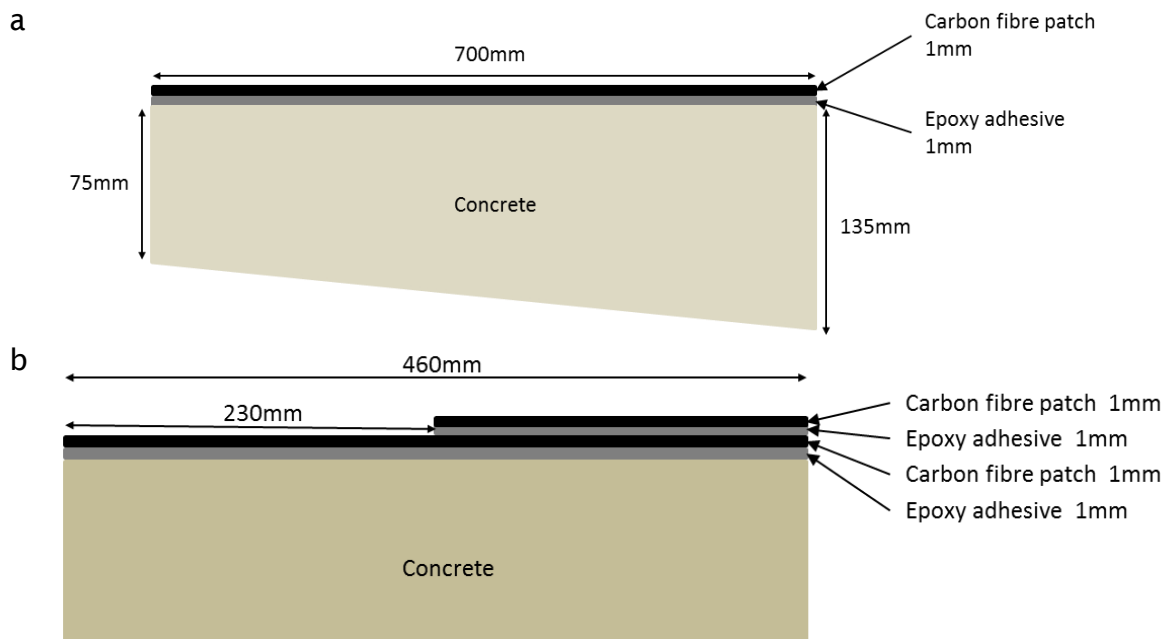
a) Sample schematic and b) bridge composite repair schematic.
